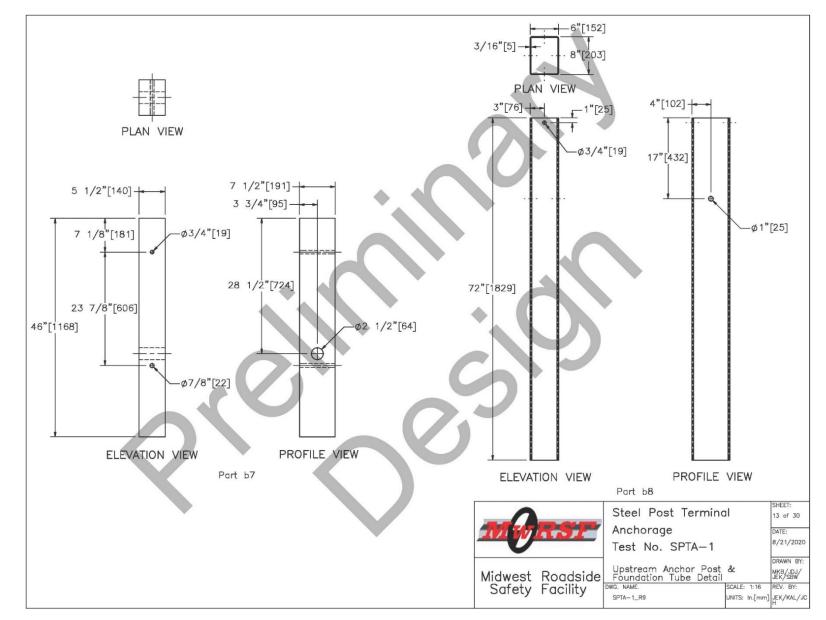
Upstream Anchor Post and Foundation Tube Detail, Test No. SPTA-1
